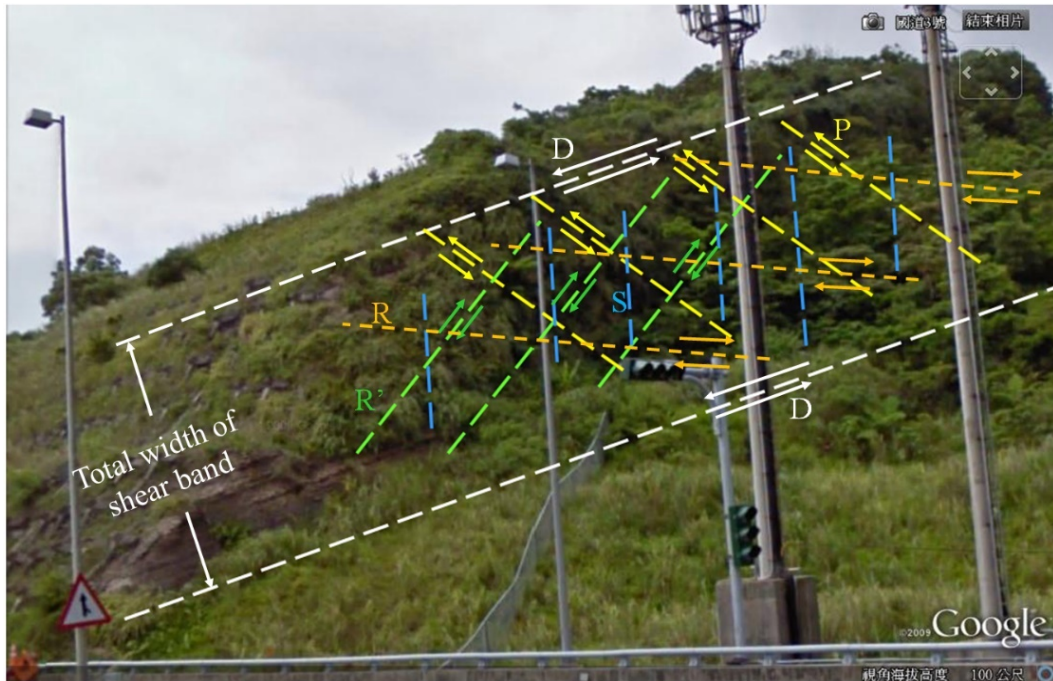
Sliding failure of the anchor retaining wall slope on Formosa Highway No. 3 at 3.1K (Taiwan Geotechnical Society, 2011).
